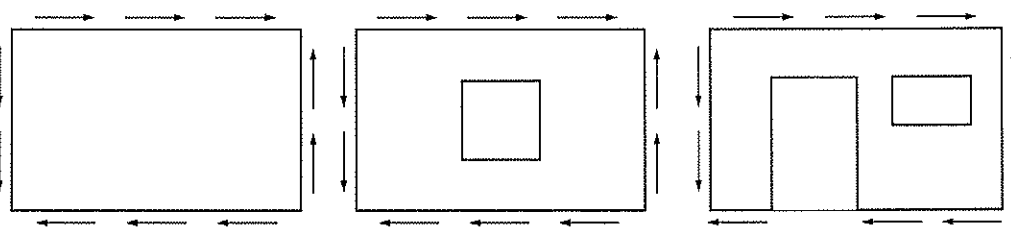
Cross laminated timber plates (CLT) used as wall elements with and without openings
